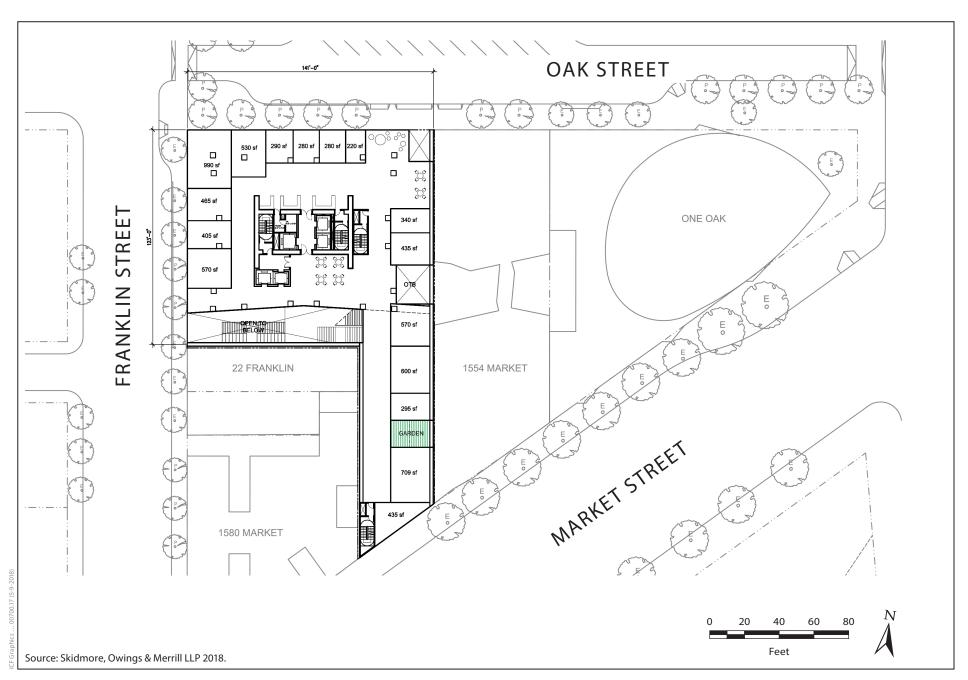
98 Franklin Street Project – Proposed 3rd Level Floor Plan
